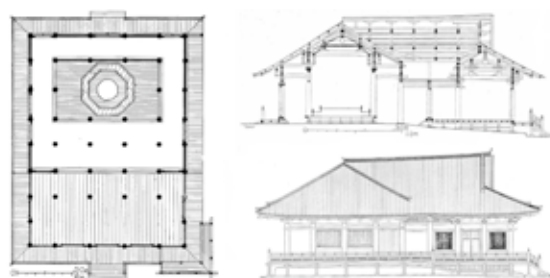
Plan, cross section and elevation of Hokkedō in Tōdai-ji.
